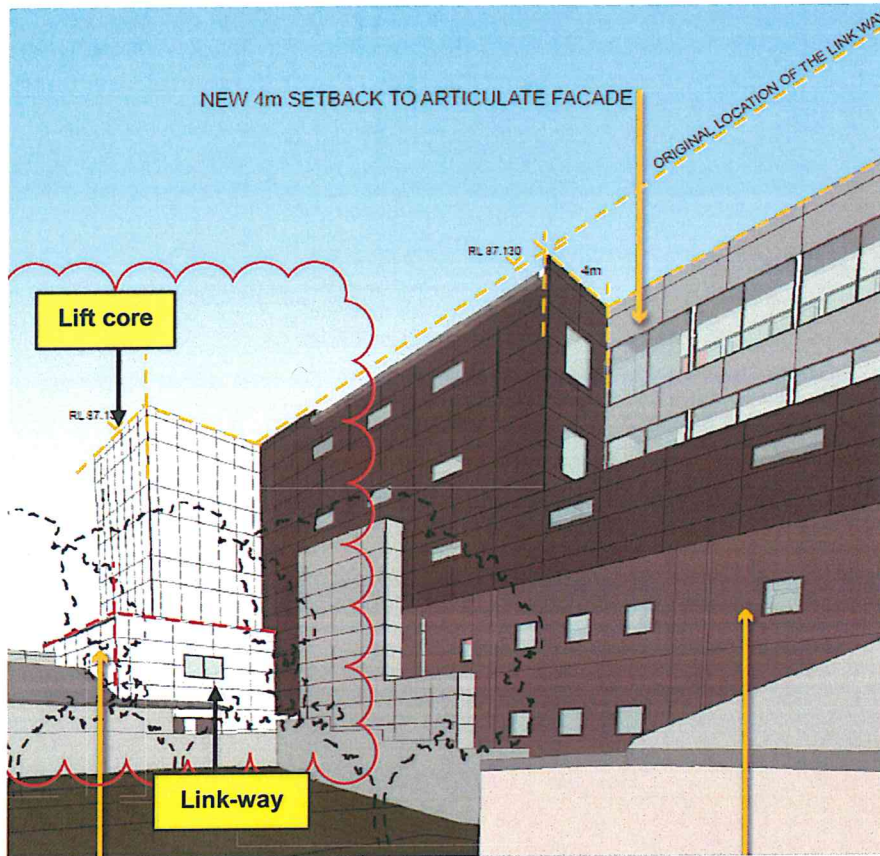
View from the rear of No. 6 Millet Street (as approved)
